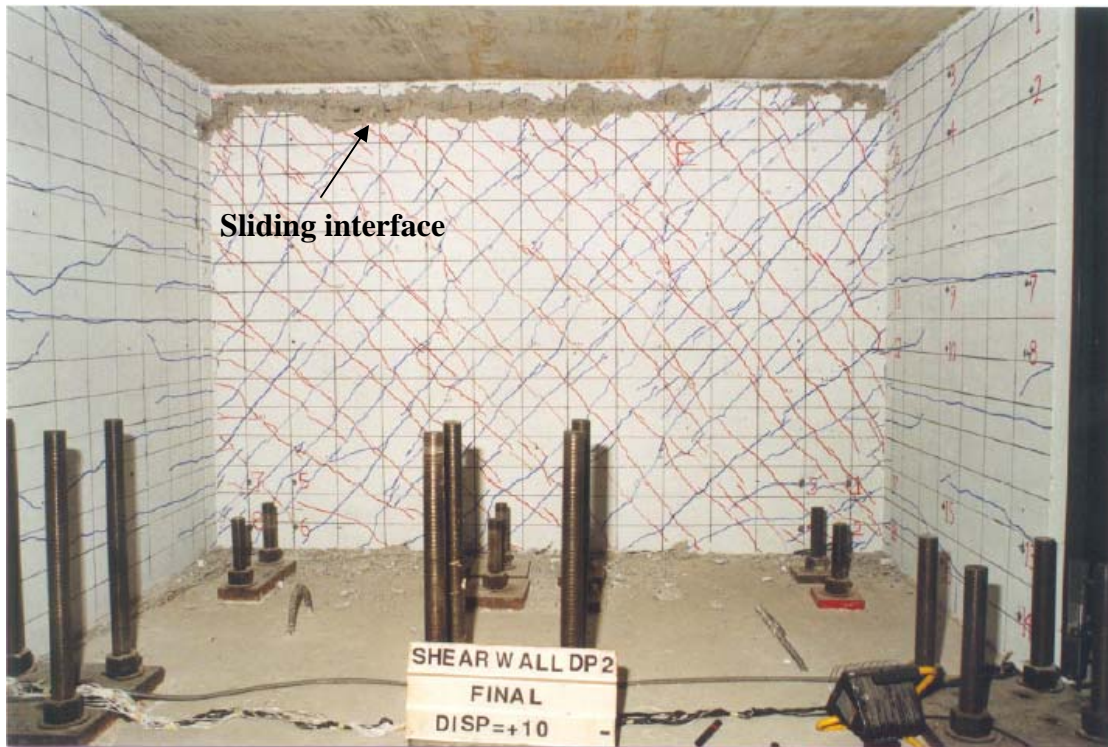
Cracking pattern for wall DP2 tested by Palermo and Vecchio (2002a) at a sliding failure between the wall web and top slab
